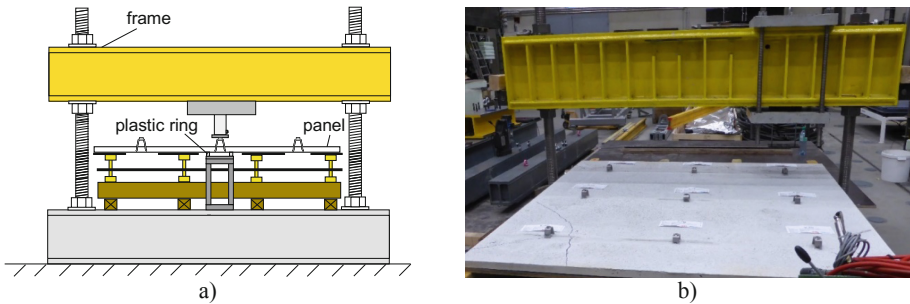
Experimental test setup “Compression” a) Drawing, b) Picture.
